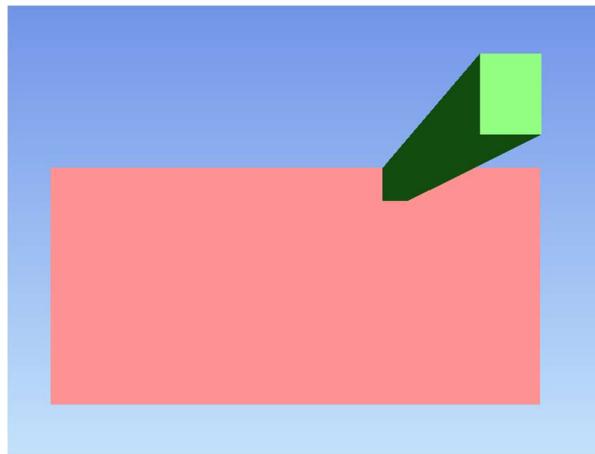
High Clash of Architectural wall (Element ID 2193) vs Structural beam (Element ID 166402) – Front View
